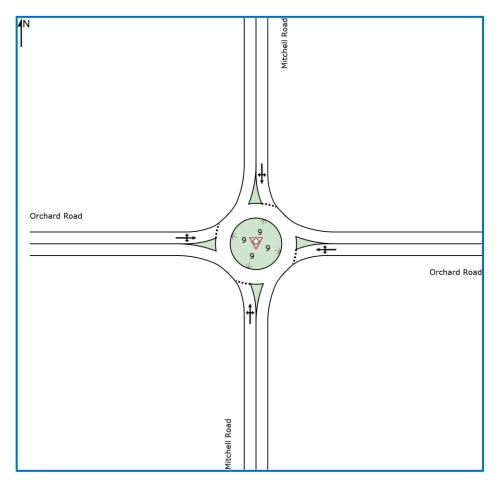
Roundabout Intersection Layout of Mitchell Road with Orchard Road (SIDRA)
